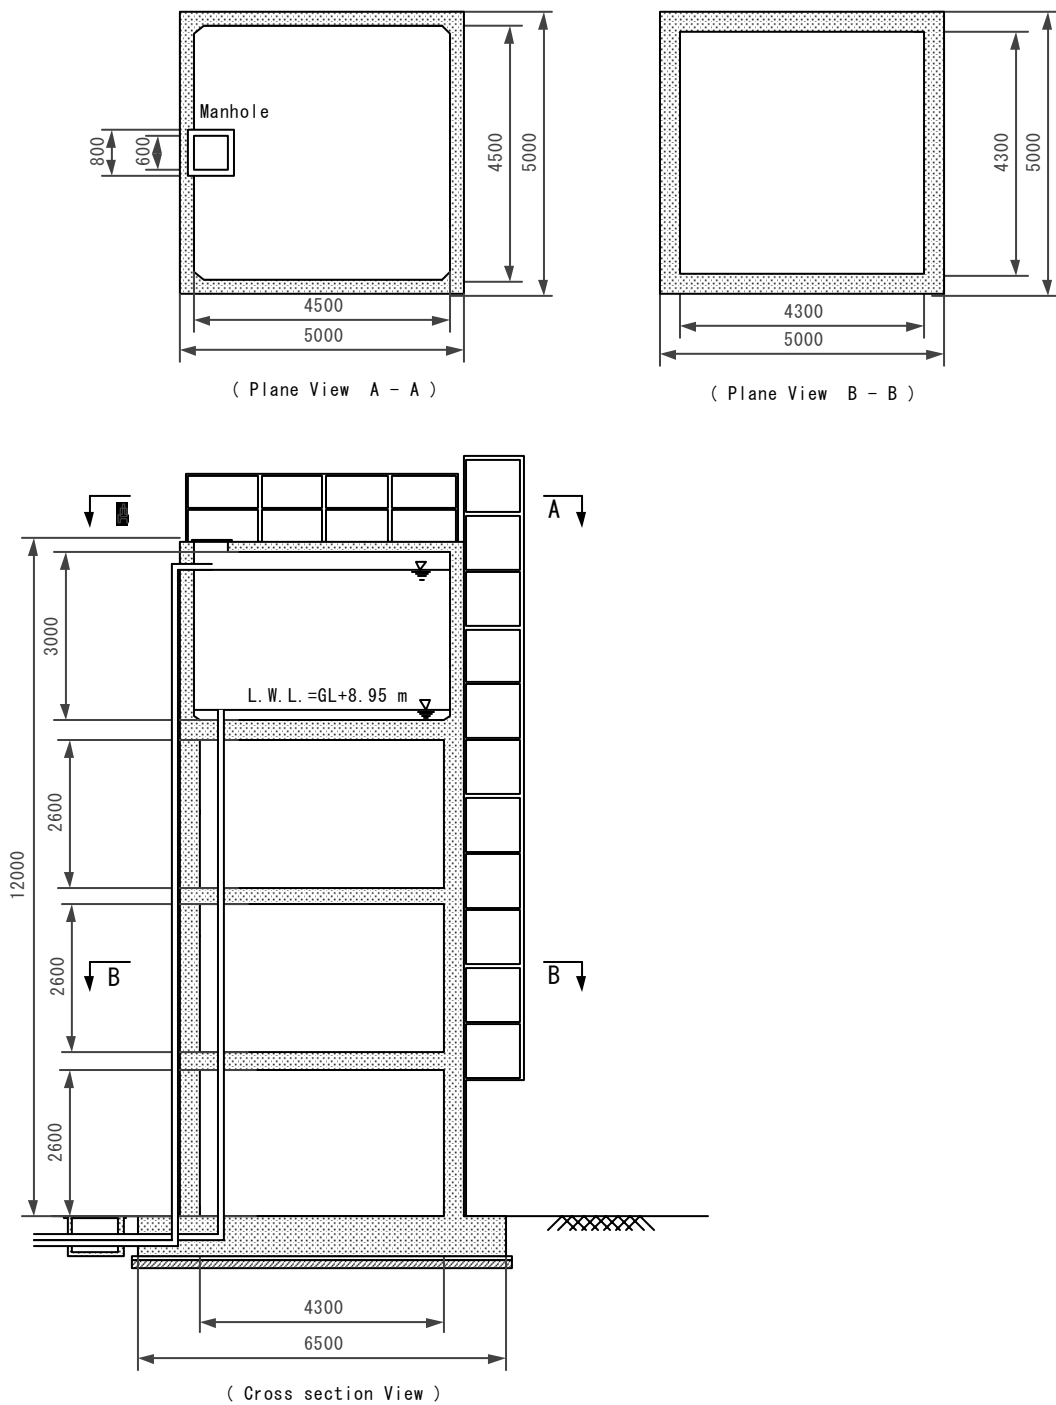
DESIGN OF STORAGE TANK -ELEVATED TANK (H = 12 M)
